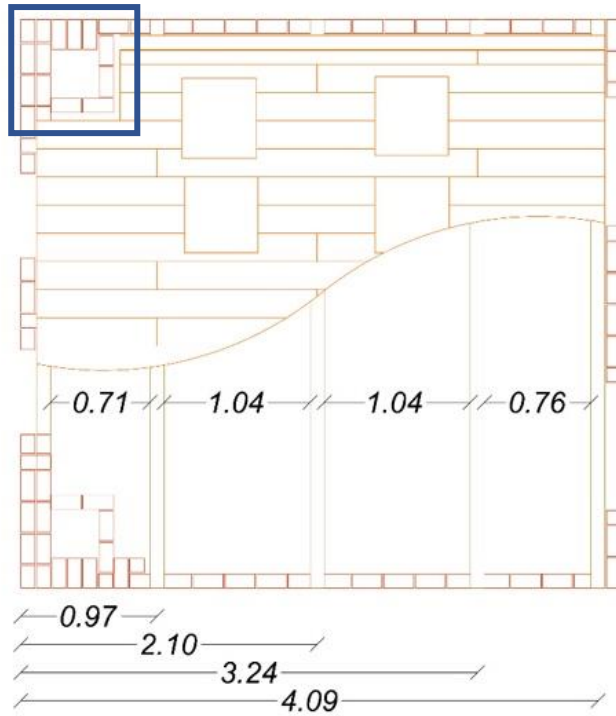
First-floor plan of the building prototype: location of the slender chimney [4, p. 5]
